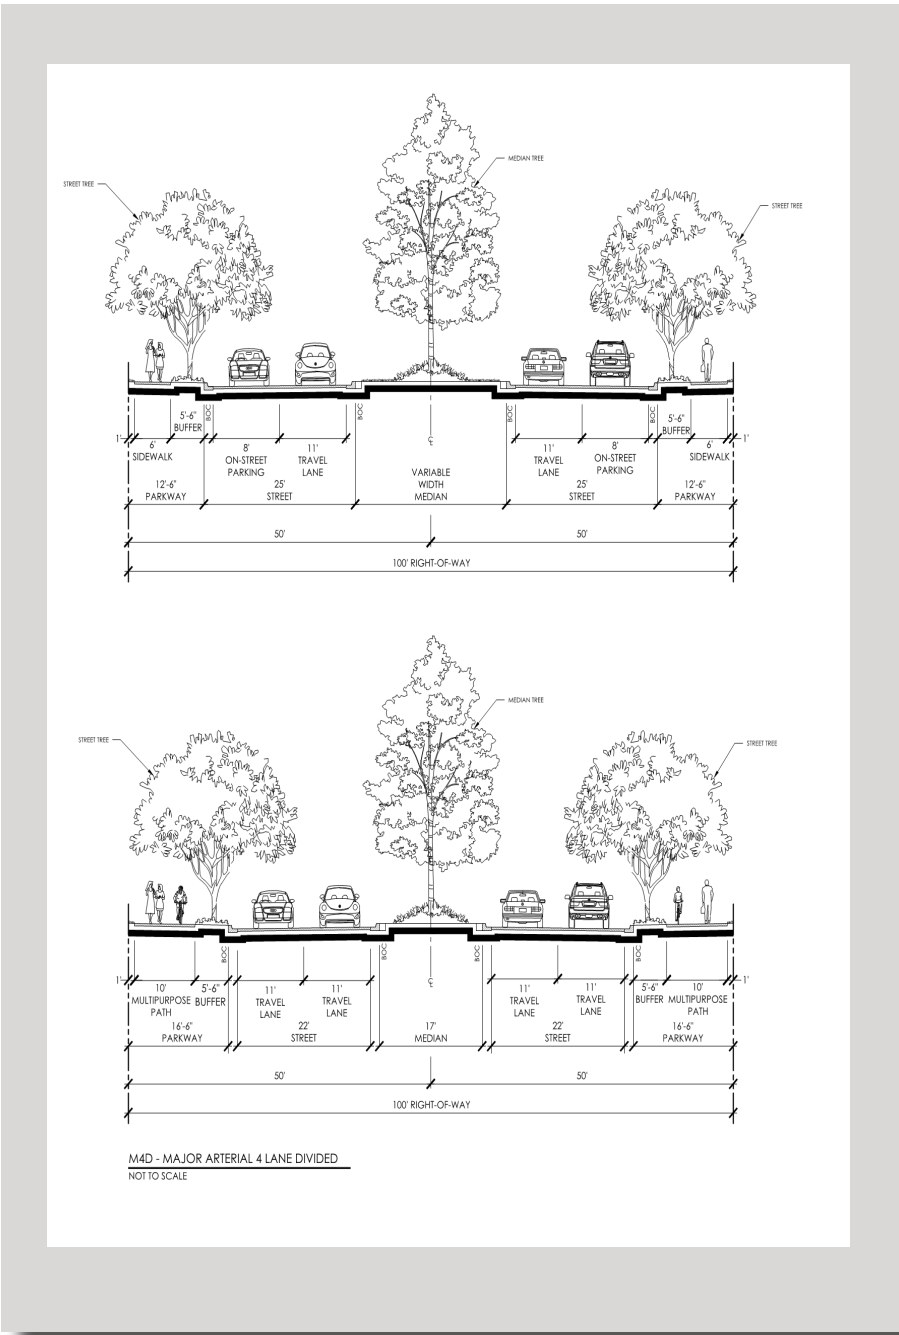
M4D Typical Cross-sections Major Arterial 4-lane Divided Cross-Sections
